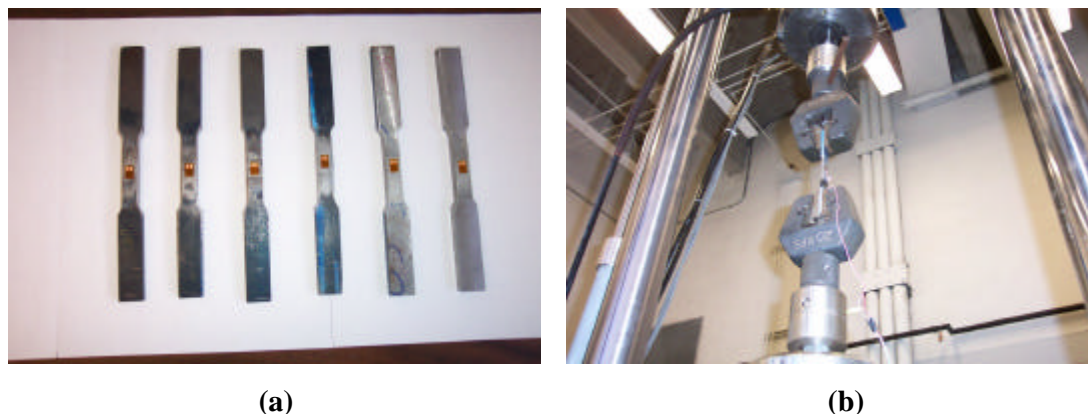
Coupon Tests: (a) Coupons from the Brace Members (b) MTS Axial-Torsion Testing Machine
